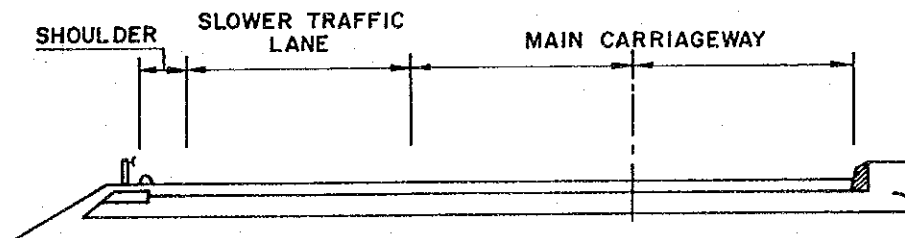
Typical Cross Section of Slow Traffic Lane Method
